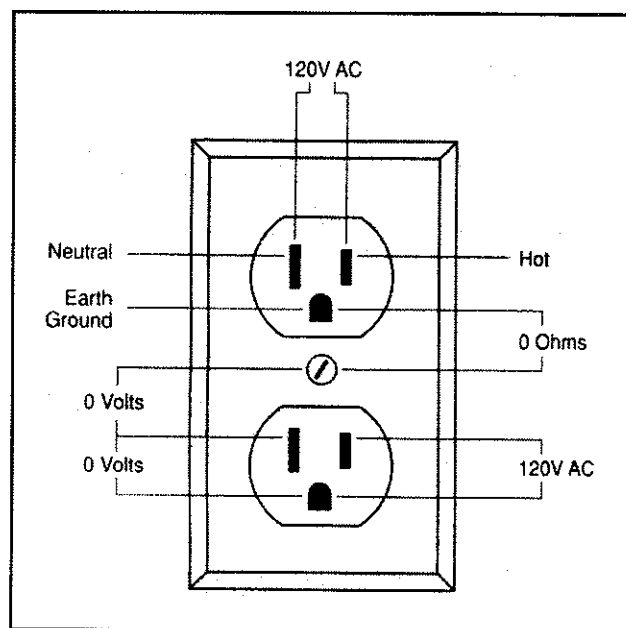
Duplex 120 VAC three-prong power outlet. Drawing courtesy of Furman Sound, Inc.
